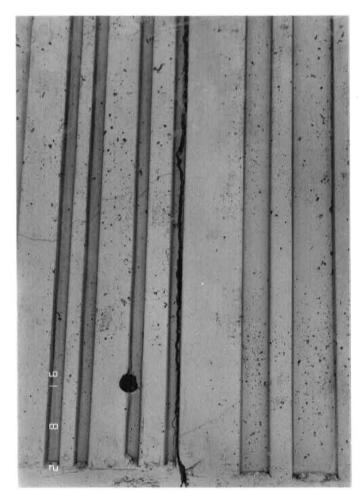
Large Vertical Crack Along the West Face of the Hilfiker Wall at the Moreland Street Drop Structure.
